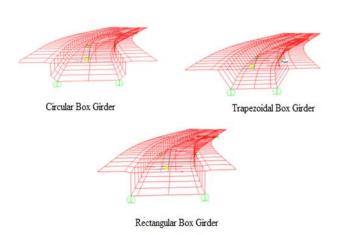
Curved Box Girders Modelled in SAP Bridge
